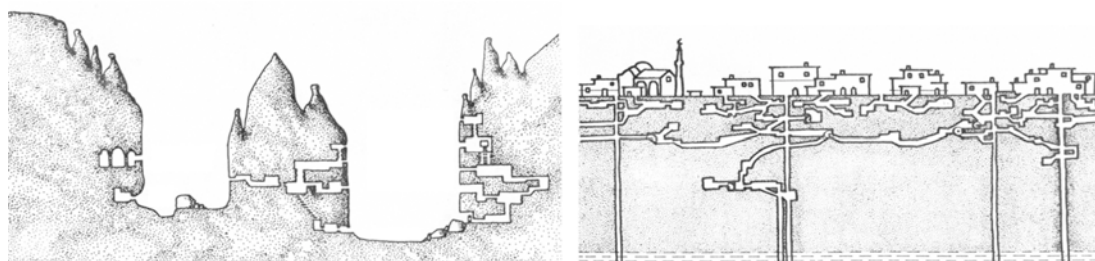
Schematic Section of cliff settlement and underground city (Ayhan, 2004)
